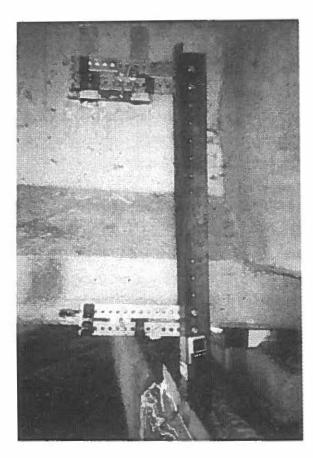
Frame to monitor girder thermal movements attached to the bridge abutment
